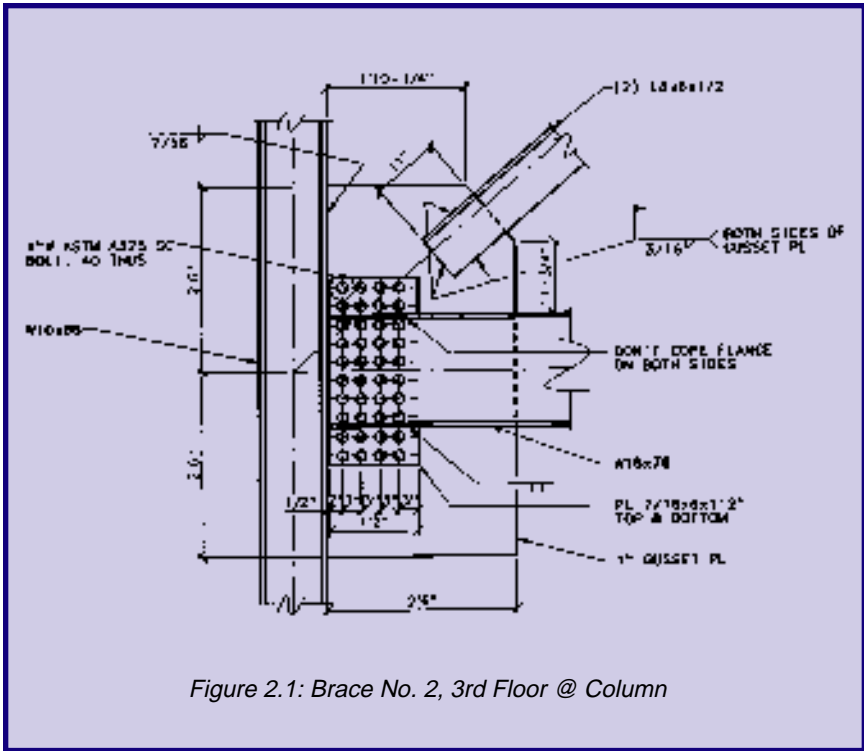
Brace No. 2, 3rd Floor @ Column
